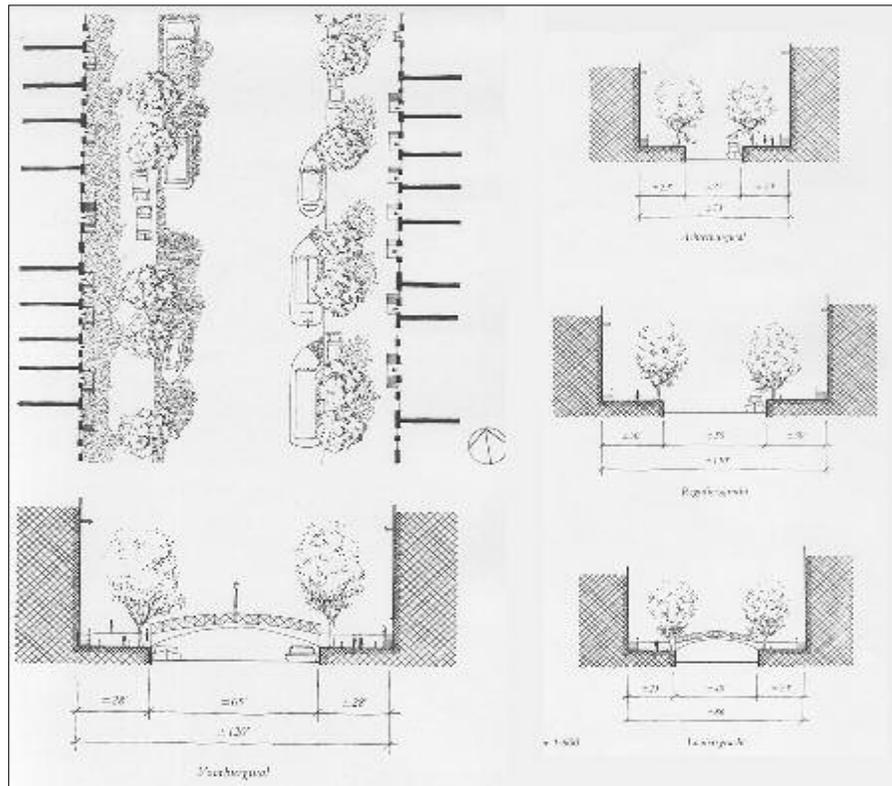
Amsterdam Canal Sections (Jacobs, Allan p.)
